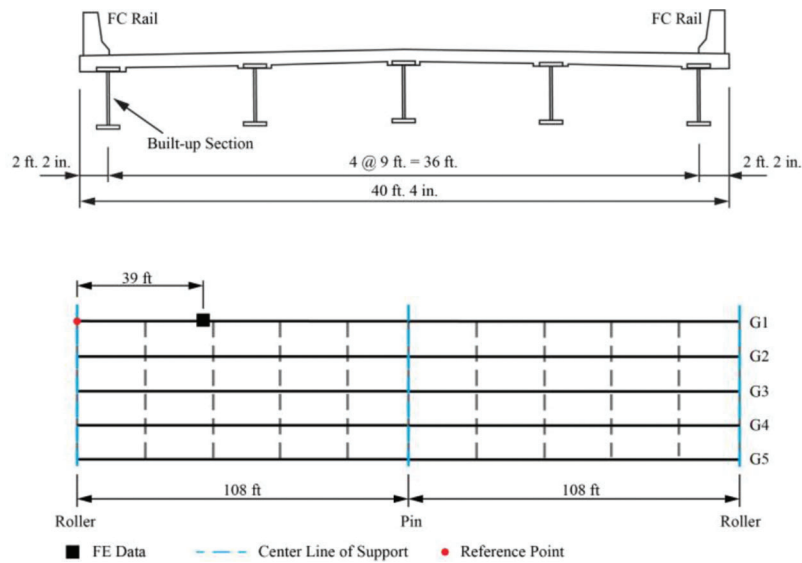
Cross-section and frame plan of the modified two-span continuous steel girder bridge.
